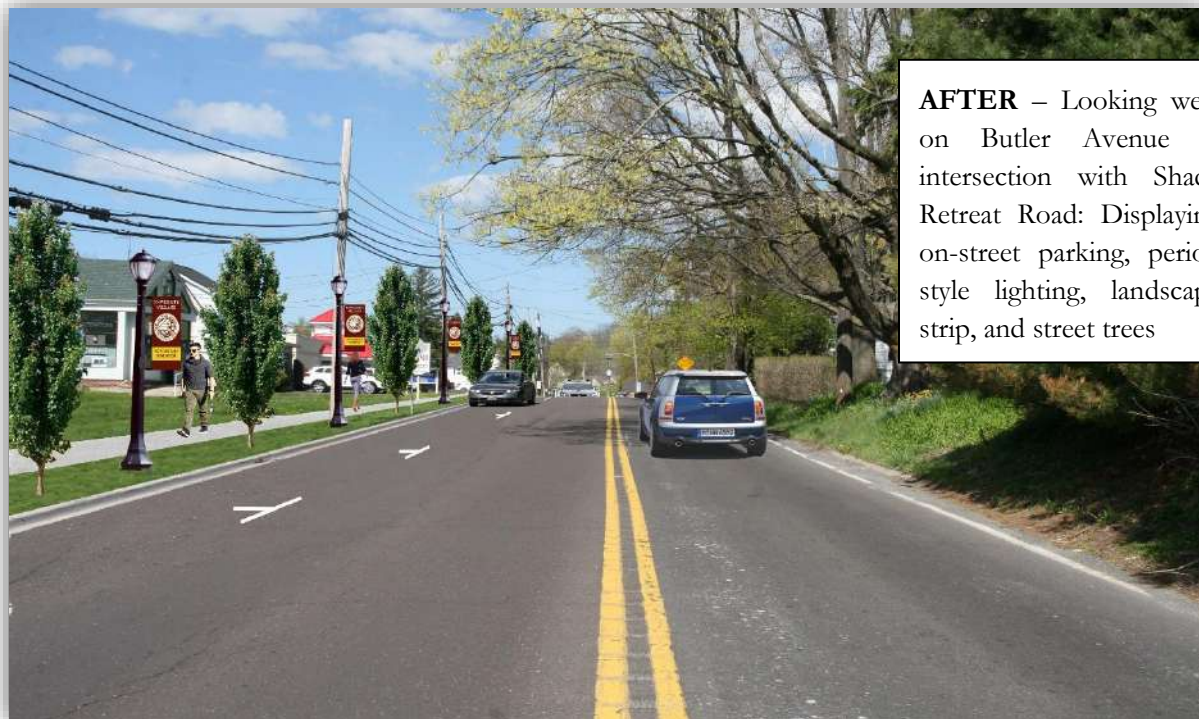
is a photosimulation created to illustrate a potential streetscape improvement. Located at the intersection of East Butler Avenue and Shady Retreat Road, improvements depicted include sidewalks with a landscaped strip, pedestrian-scaled period lighting, street trees, and on-street parking. Also depicted is an element of access management, whereby the driveway access onto Butler Avenue has been eliminated. Much like the previous cross-section illustration, this graphic is meant to show how the design solutions could be applied within the segment. Site specific design solutions would be decided upon as development and redevelopment occurs.
